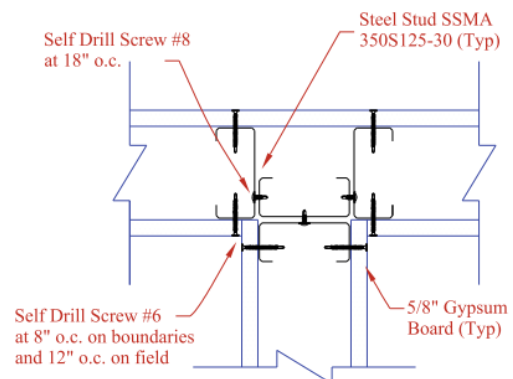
Typical industrial partition wall intersection detail (Davies et al., 2011)
